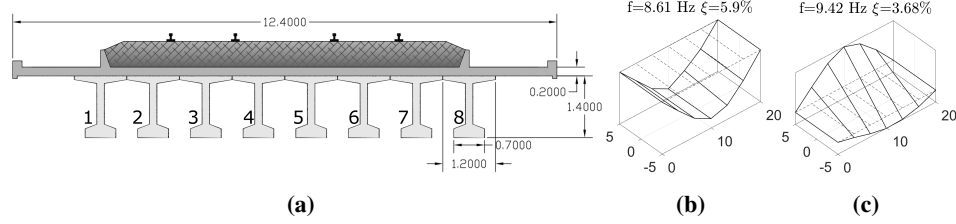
Cross-section details with beams numbering and first two experimental mode shapes.
